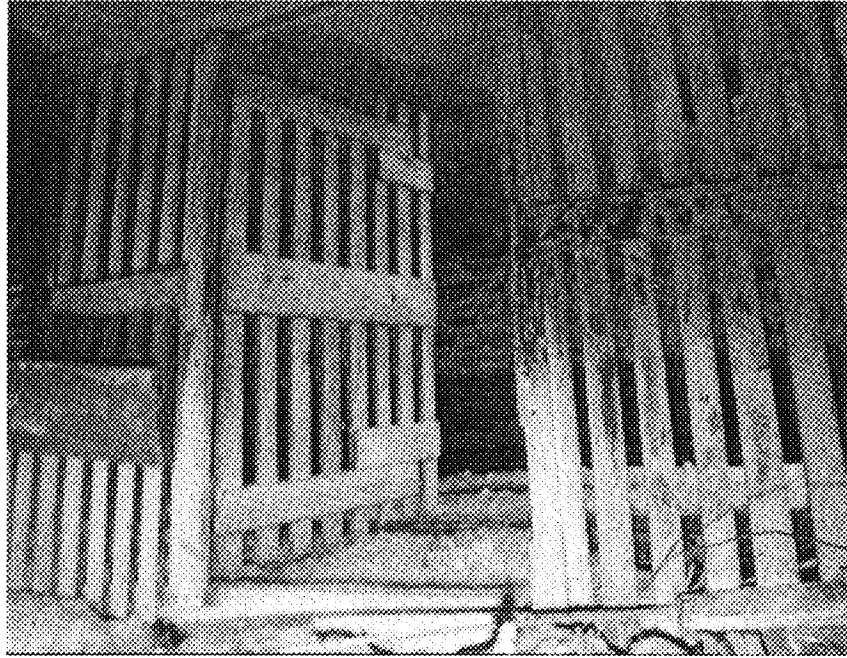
Milk Safe at Fawcett House, 517 Prince Street, Alexandria
